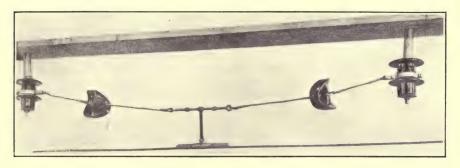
Great Northern Railway. Insulator Support in Concrete Roof of Tunnel, Parallel to the Contract Line.
